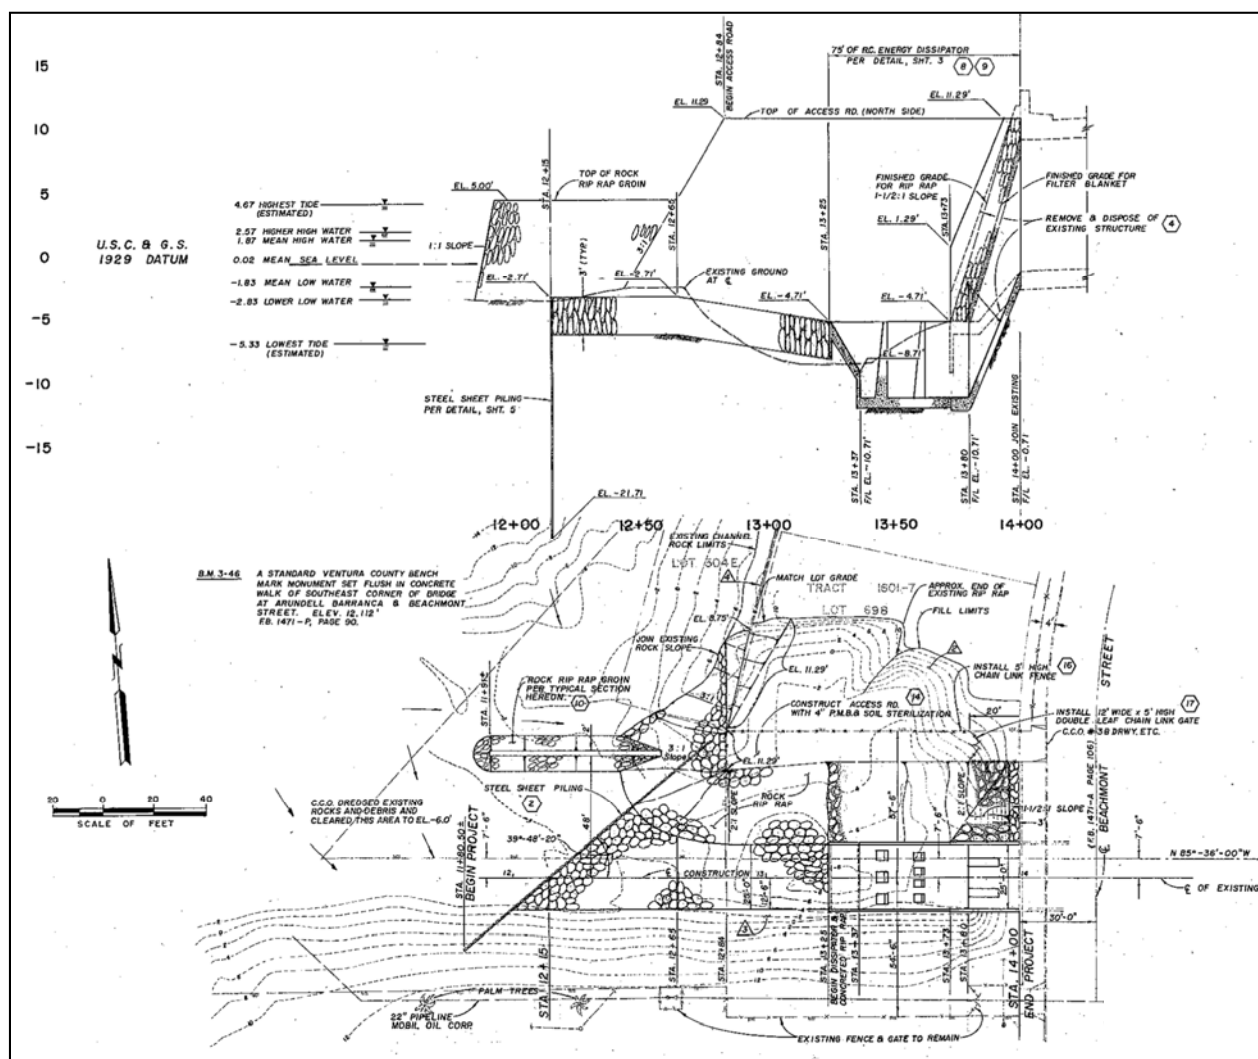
Plan and profile view of the existing outlet channel and energy dissipator at the downstream end of Arundell Barranca, constructed in 1974
